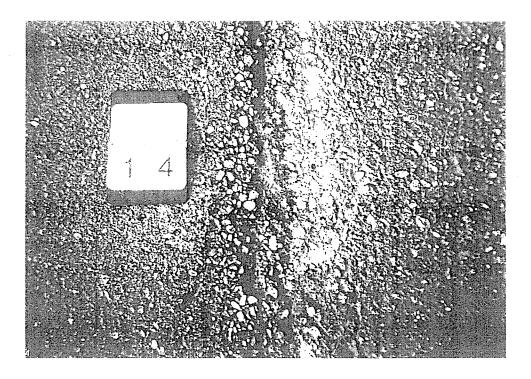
Crack of Photo 3.31 After Vacuum Blasting
